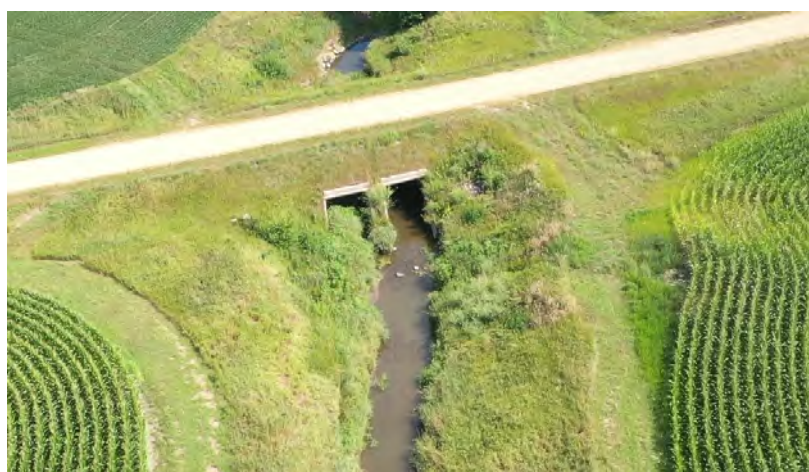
Vegetation Growth in Culvert Crossing across 119th Street in Section 17 of Sterling Township
